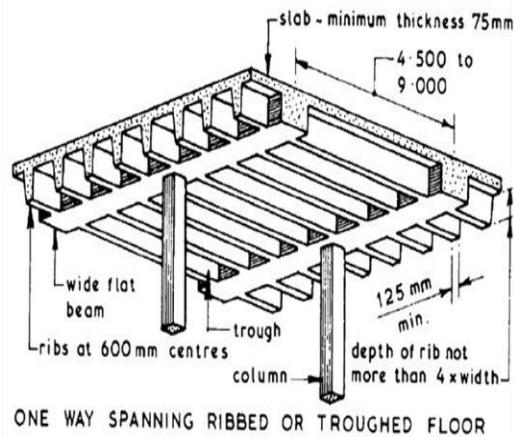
One Way Spanning Ribbed Slab (Source <http://www.slideshare.net>)
